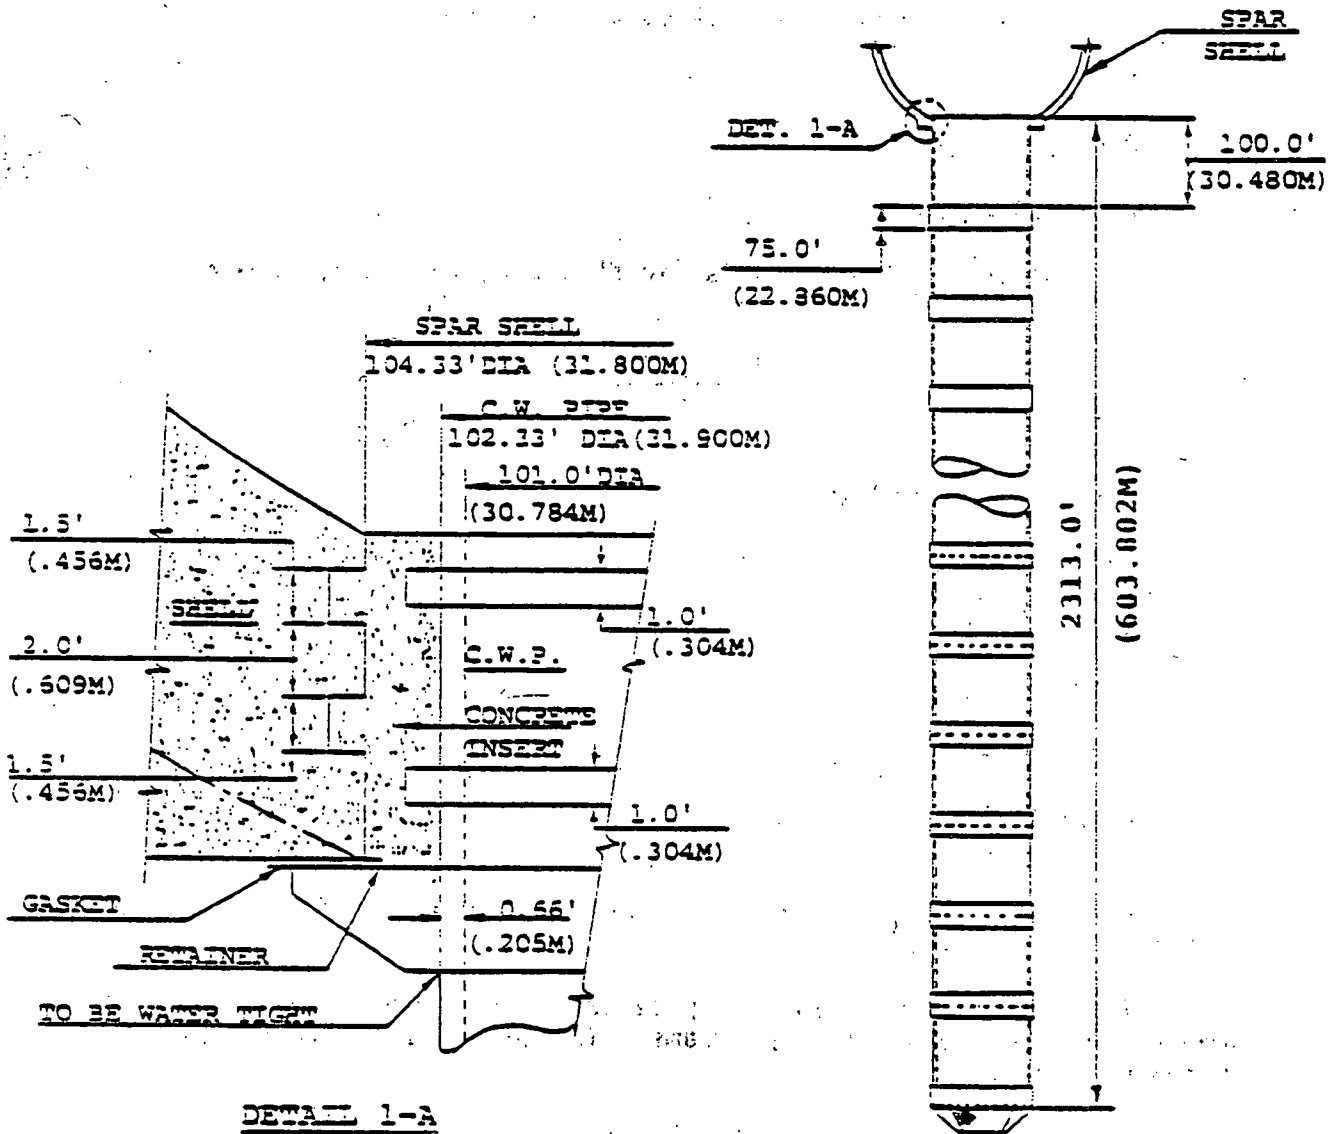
depicts the basic configuration of the MR&S spar/CWP arrangement.
